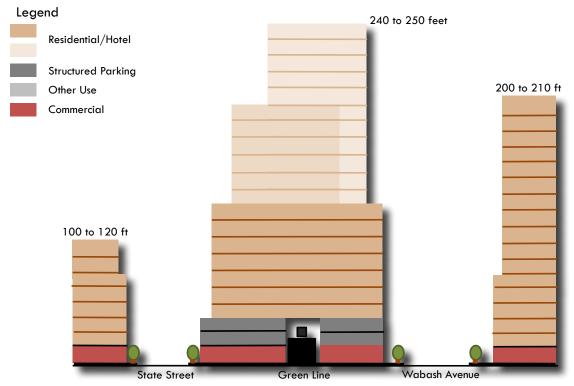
Conceptual Cross Section of Future Building Heights along Cermak Road
